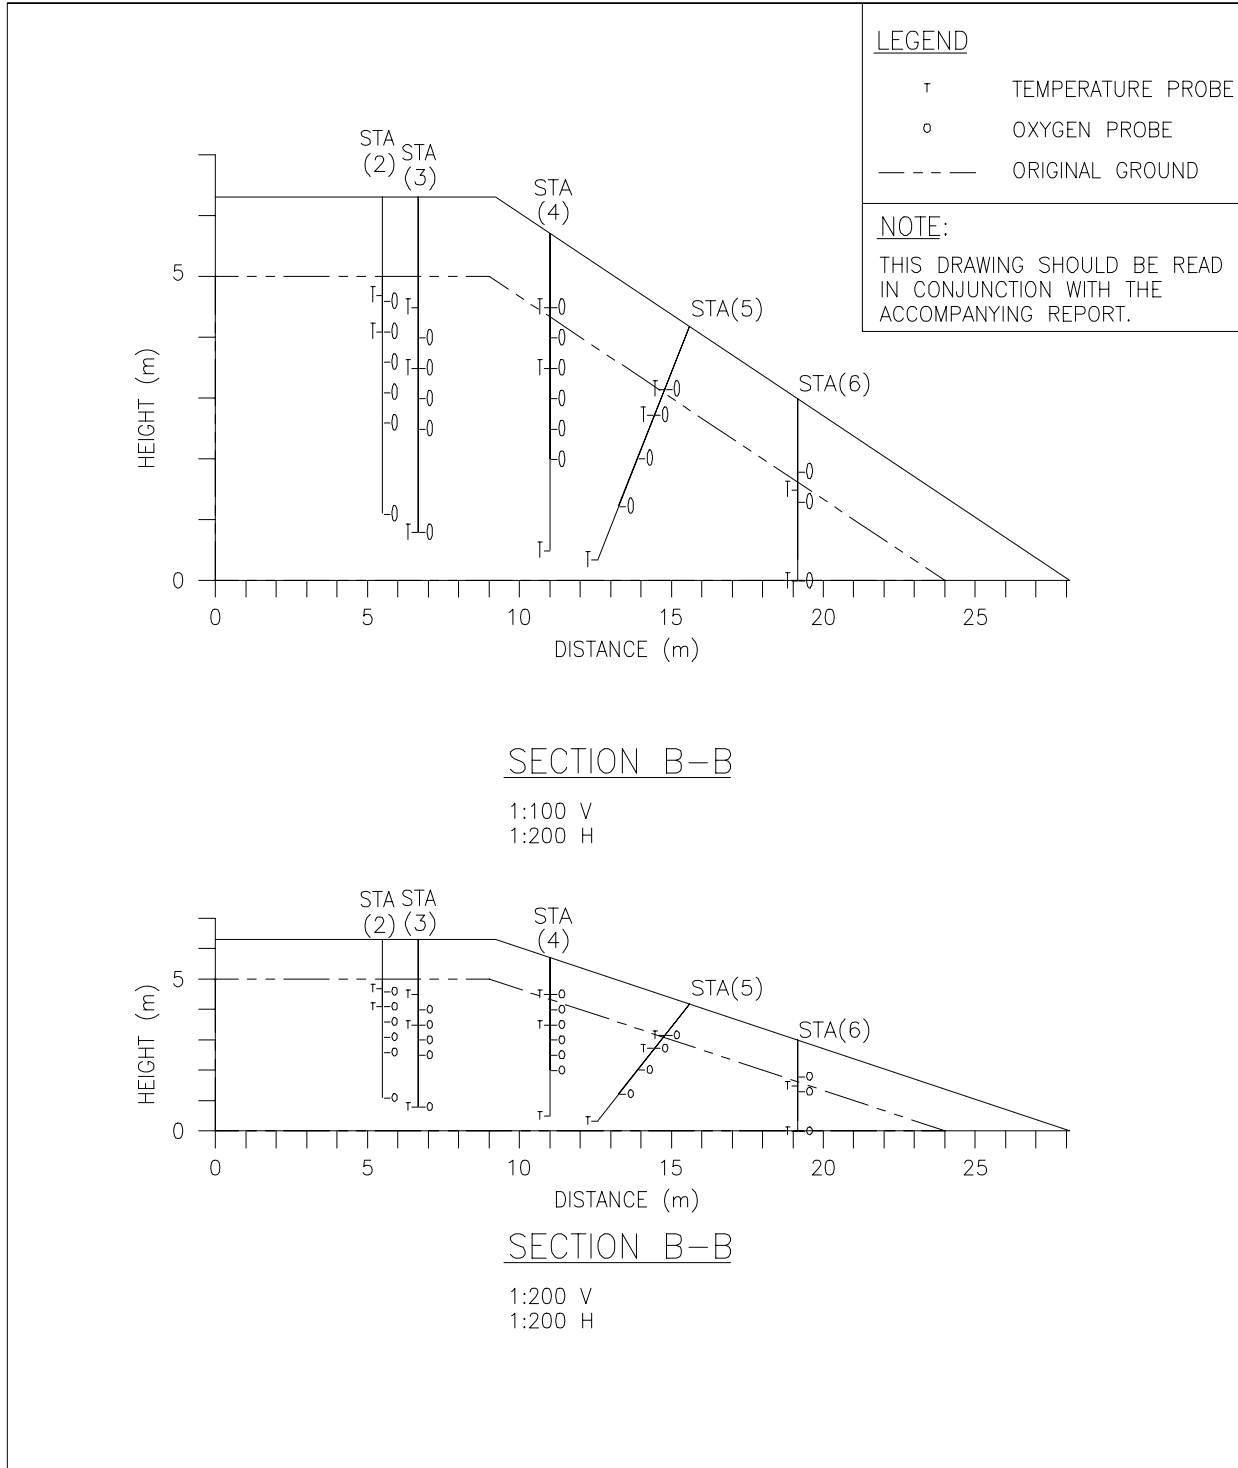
Cross-Section, Waste Rock Pile 7/12
